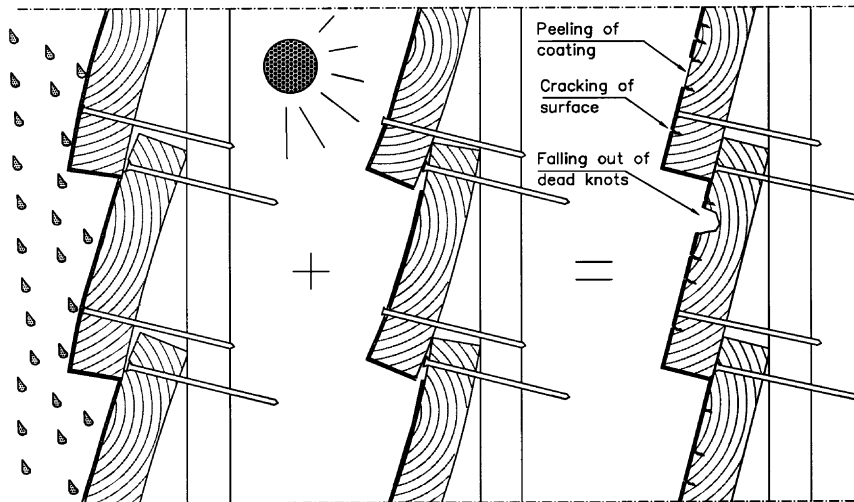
Typical damage to wooden claddings due to weathering.
